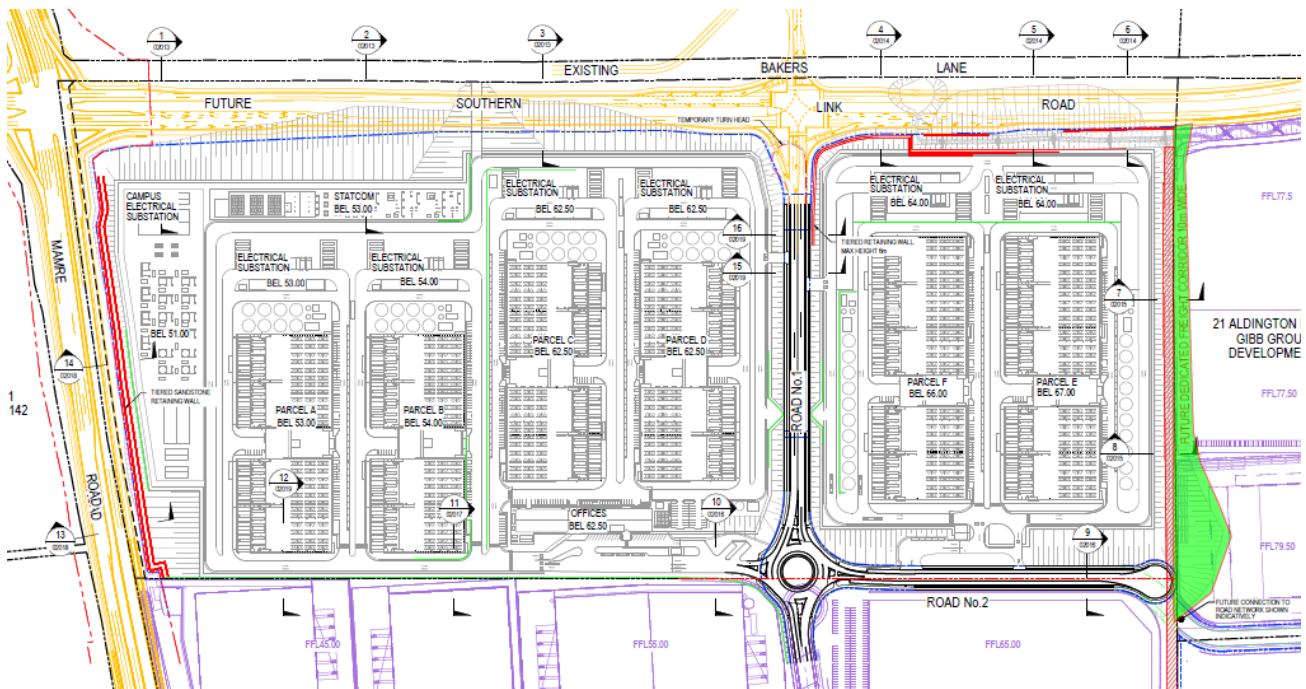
Civil Engineering Plan Markup showing works proposed on the site to the east at 1-22 Bakers Lane¹.
